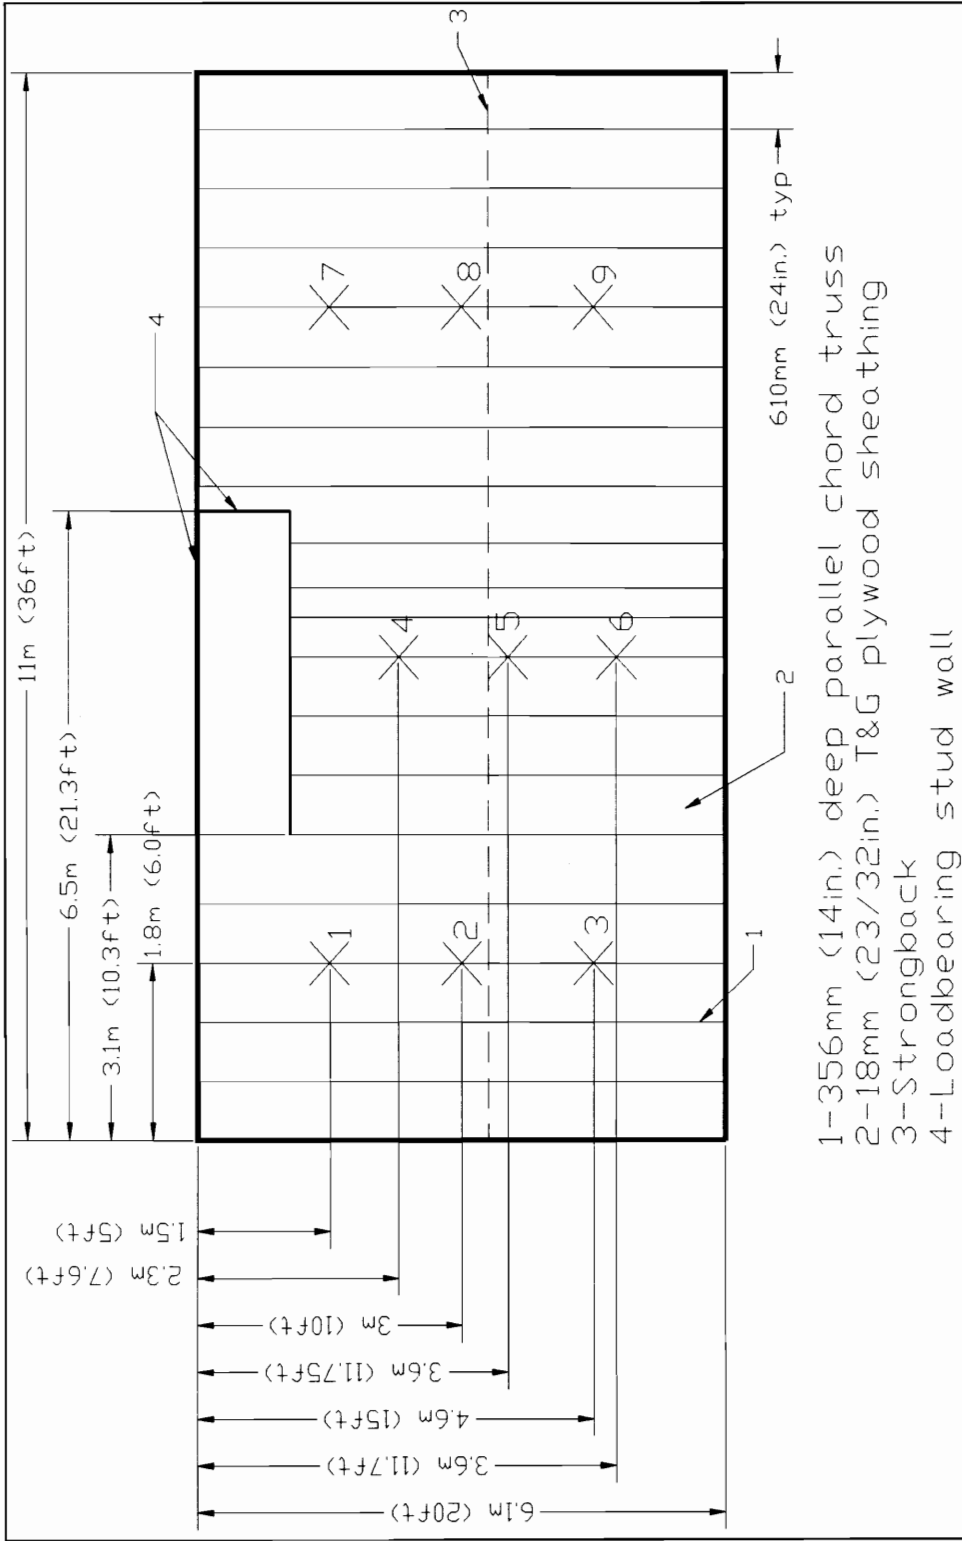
Structural Plan of Parallel Chord Truss Townhouse
